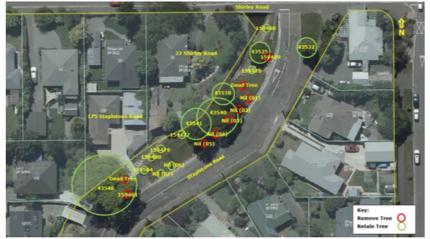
Site and tree locations, Shirley Road to 175 Stapletons Road.
